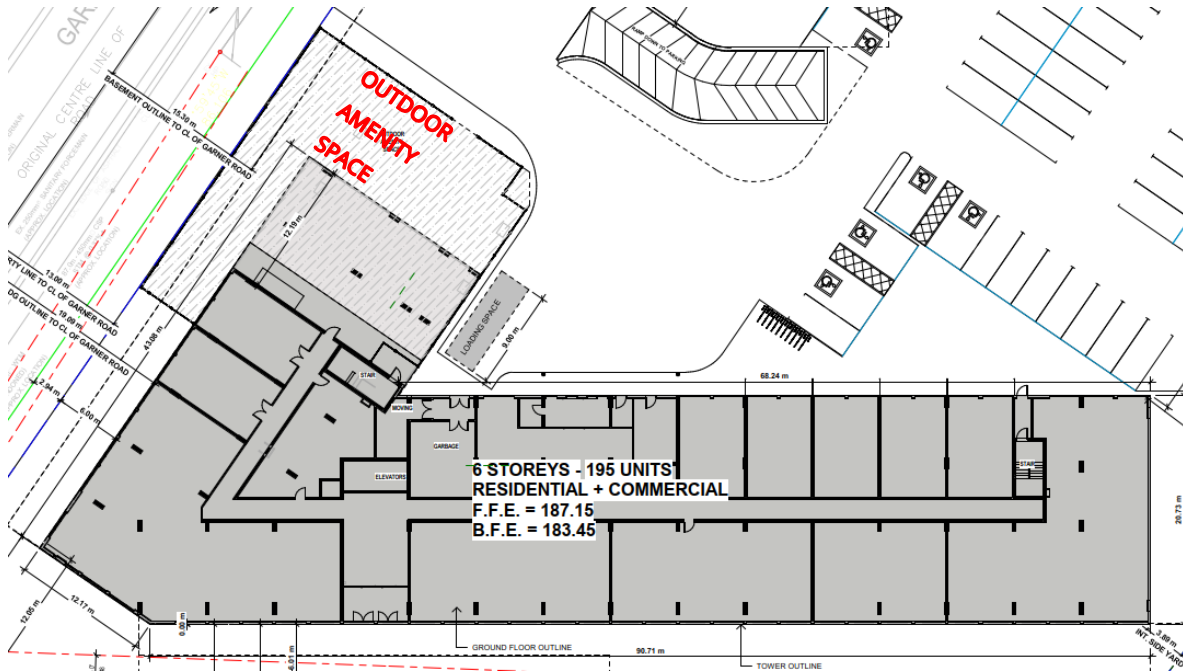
Site Plan Based on the New Drawings Received on April 16, 2025
